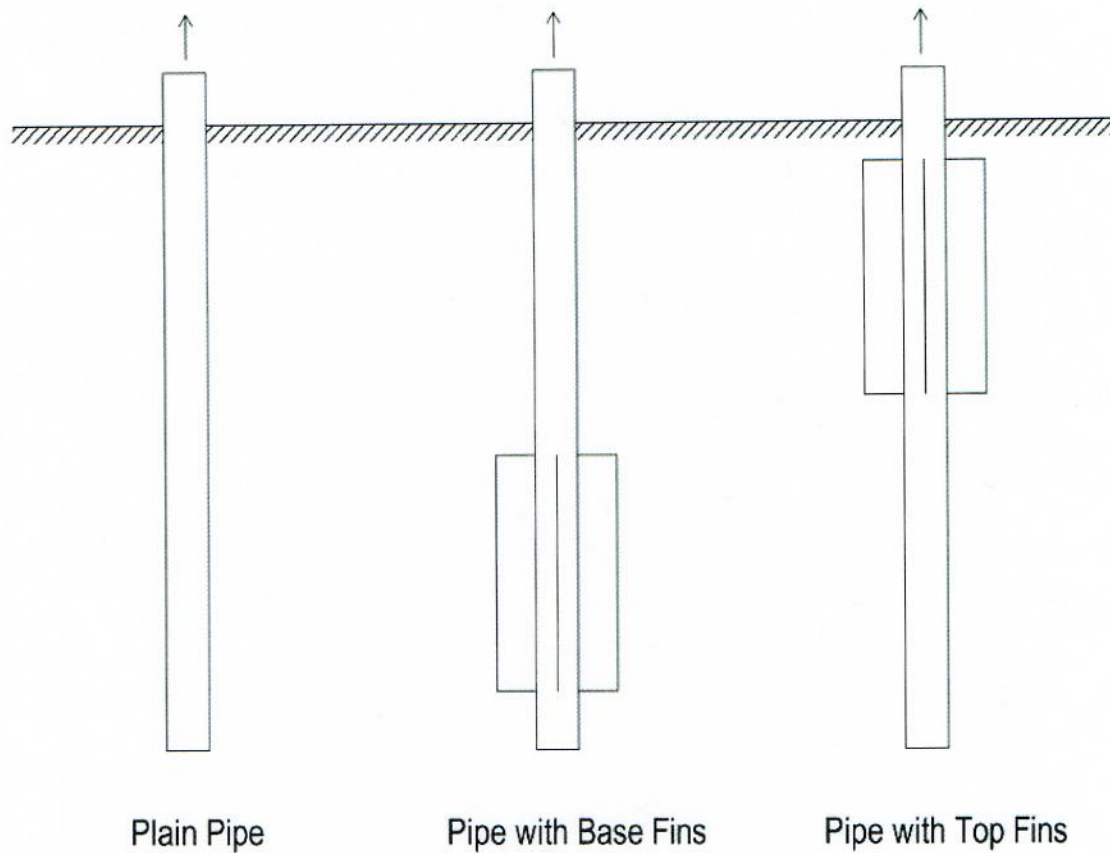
Schematic of Different Plain and Fin Piles Tested.
